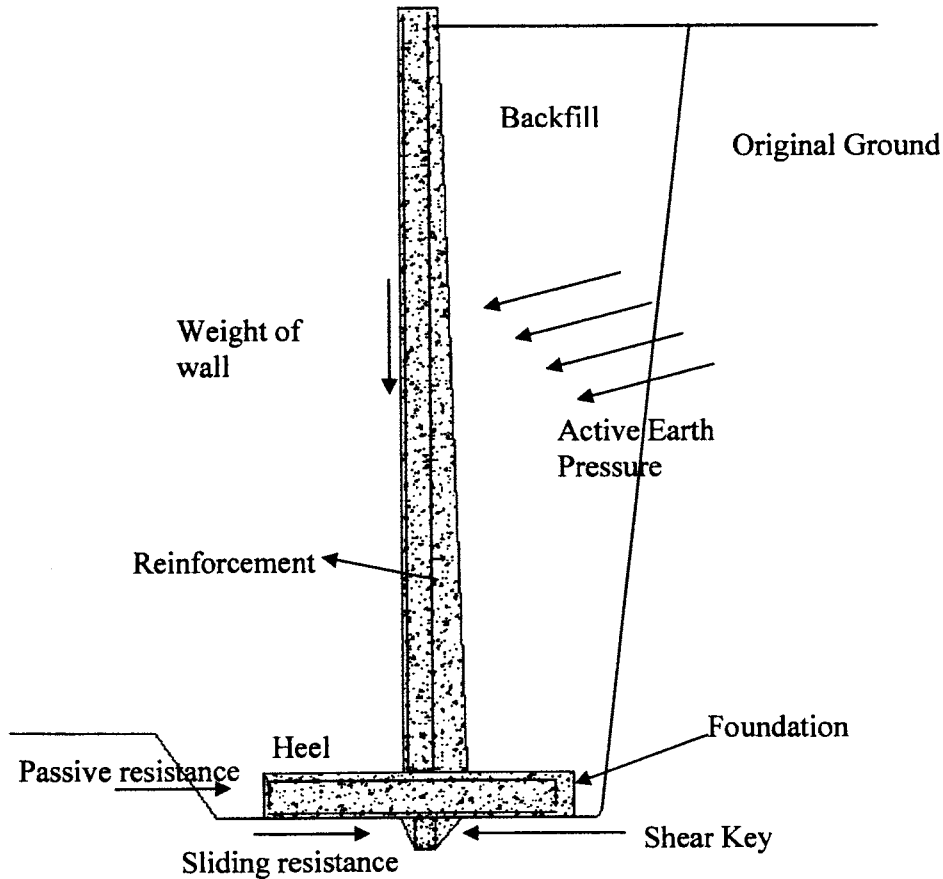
Picture showing the components of cast-in-place Cantilever retaining wall
